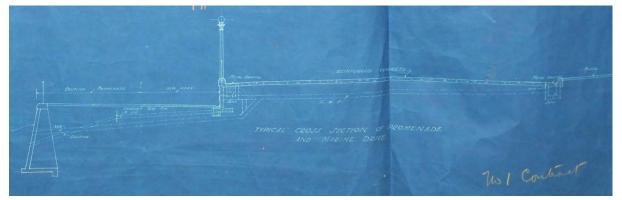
Construction drawing of Marine Drive held in the Mitchell Library. The sea wall that had been constructed earlier is shown at left. Source: ML photograph of original plan
